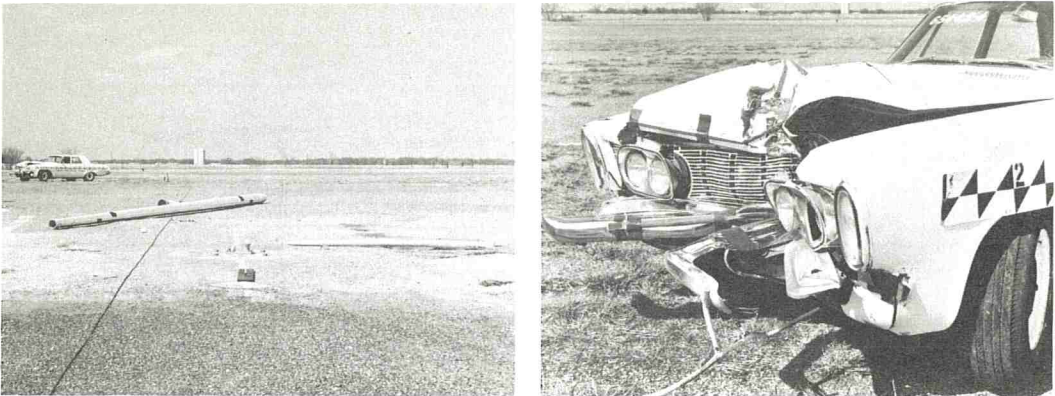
Final position of and damage to luminaire support, Test LS-4.
